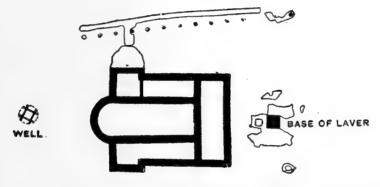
PLAN OF AN EARLY CHURCH AND ITS SURROUNDINGS IN INSULA IV. (Scale, 30 feet to an inch.)
